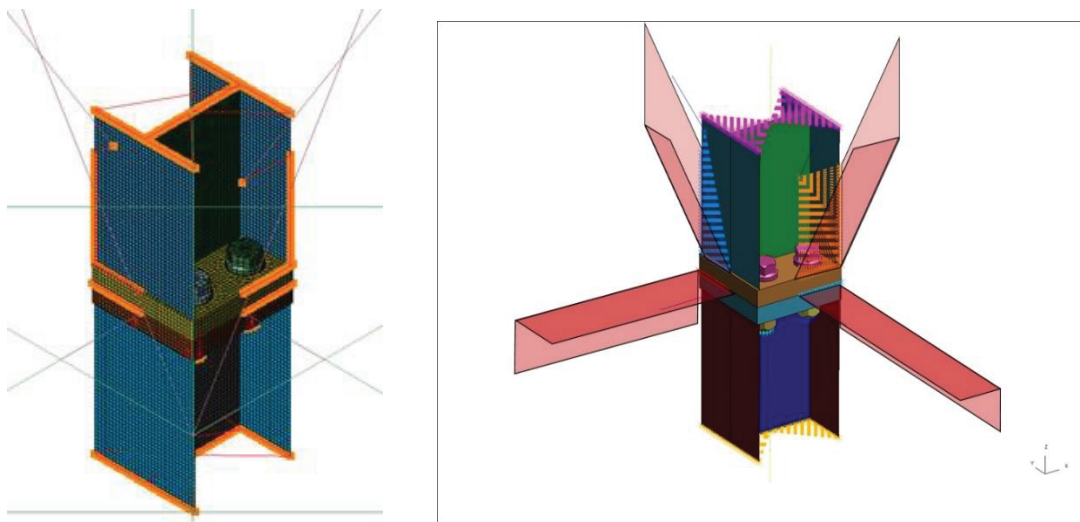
Modeled connections between the end plate–type tensile bolted joint, horizontal members, and vertical bracings
